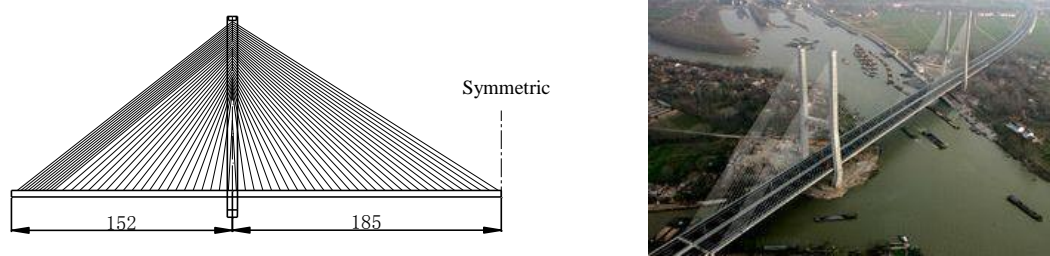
Engineering drawing of design scheme and field photo of Wuhekou cable-stayed bridge (Unit: m)
